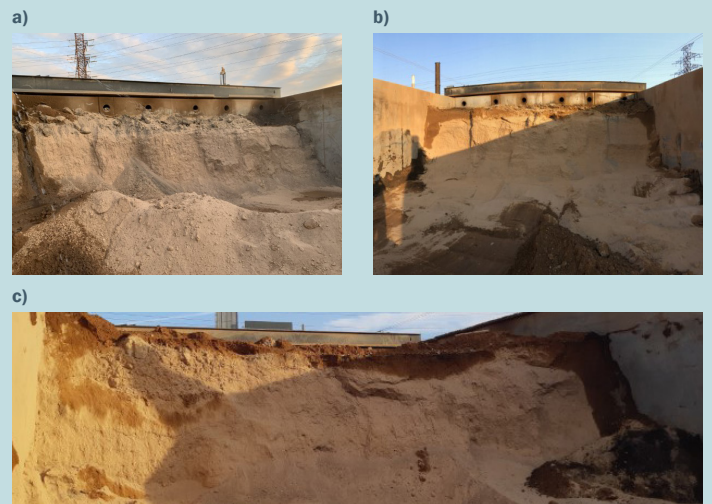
a-c Examples of excavated soils following STARx treatment meeting site-specific (CBRA1 and MECP Table 3) criteria for on-site re-use.
